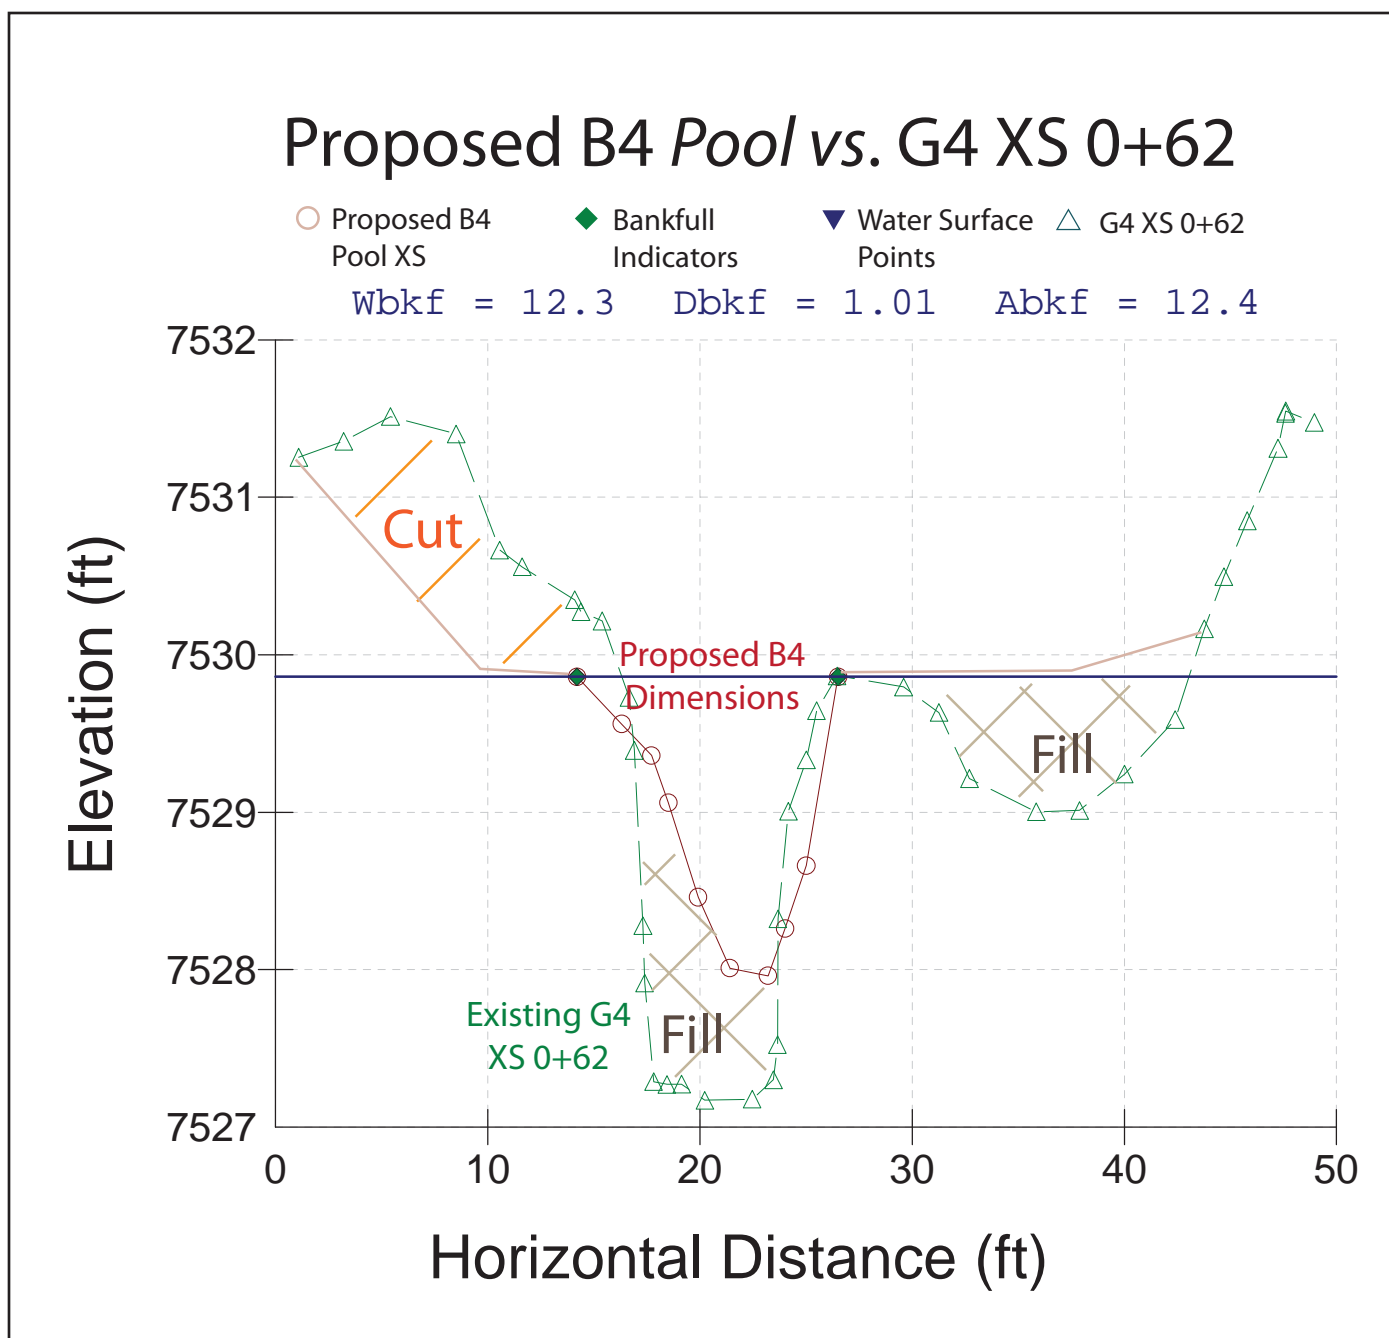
The proposed B4 *pool* cross-section compared to the existing G4 cross-section 0+62, indicating the cut and fill requirements and new bankfull elevation.
